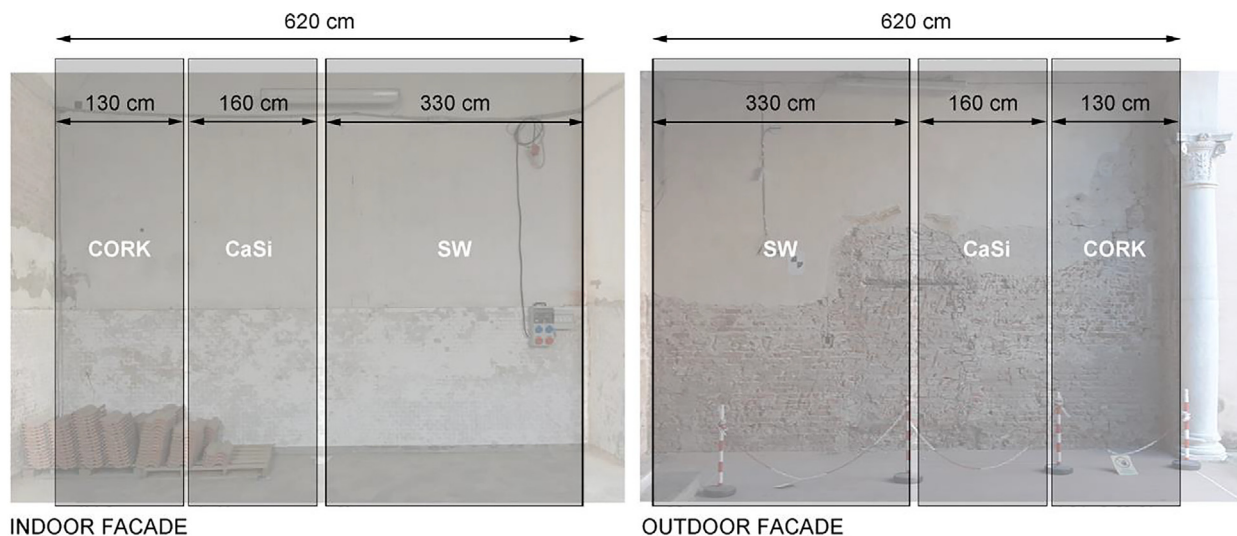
Layout of the insulation distribution on the historic wall: indoor façade elevation on the left and outdoor façade elevation on the right. The extension of the tested products varies in relation to the use of two different hot boxes (see Section 2.4 for more details).
